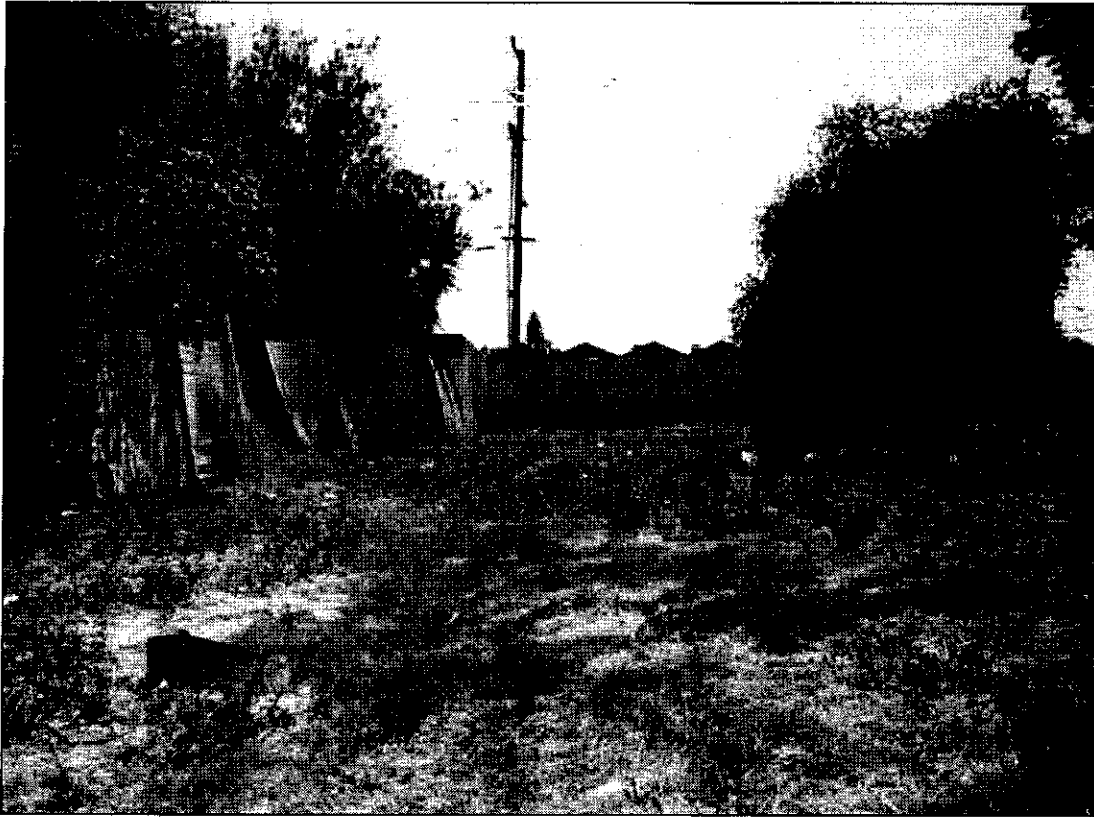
Project site: 1335 W. 105th Street, facing north [4 September 2006]
